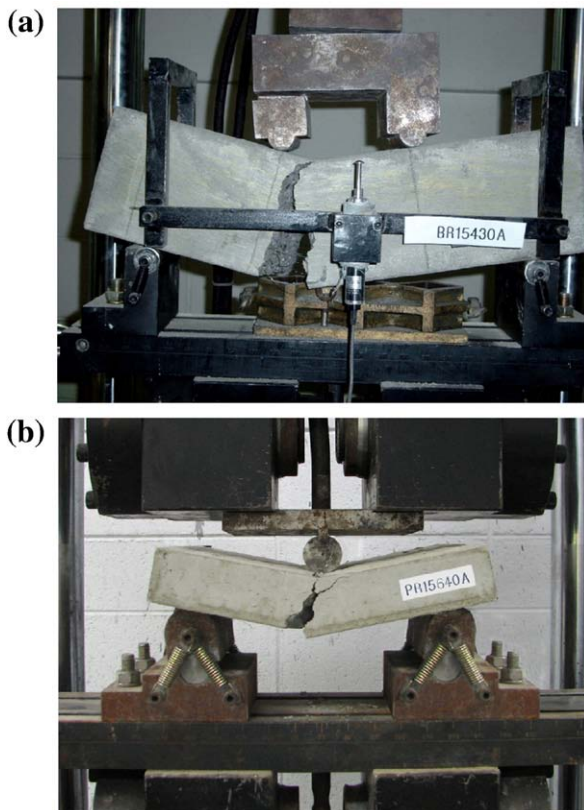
Fractured specimens after test: (a) beam type specimen; (b) panel type specimen.
